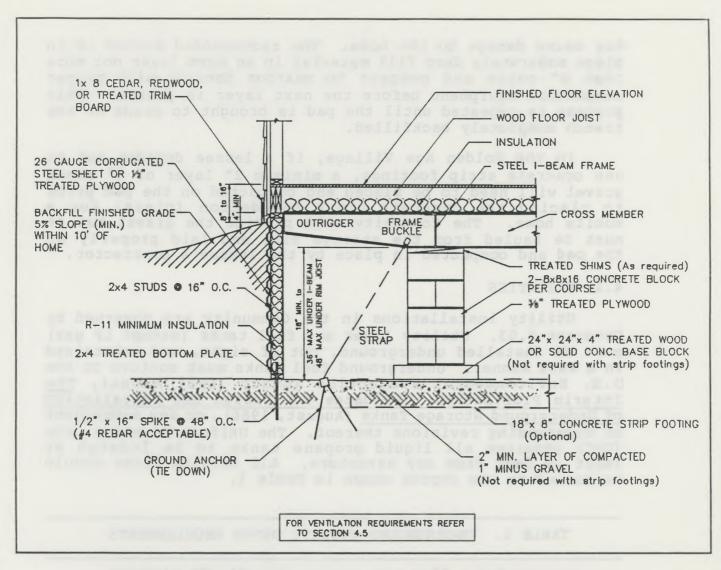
STANDARD DETAIL FOR PIER CONSTRUCTION, GROUND ANCHORAGE, AND RECESSED SKIRTING
